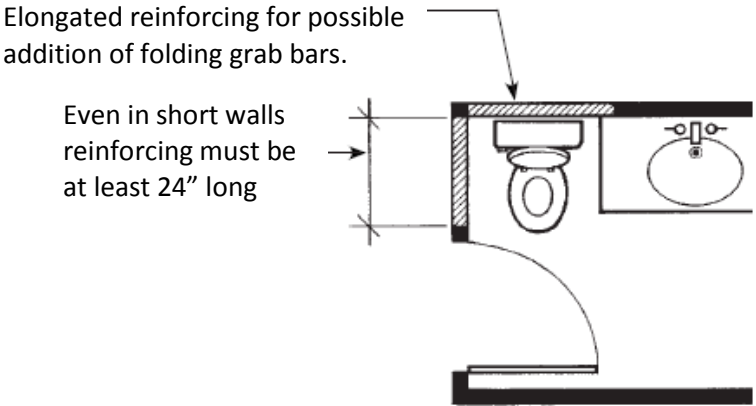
Reinforcing beside Toilet Shorter Because Door is Located on Same Wall
